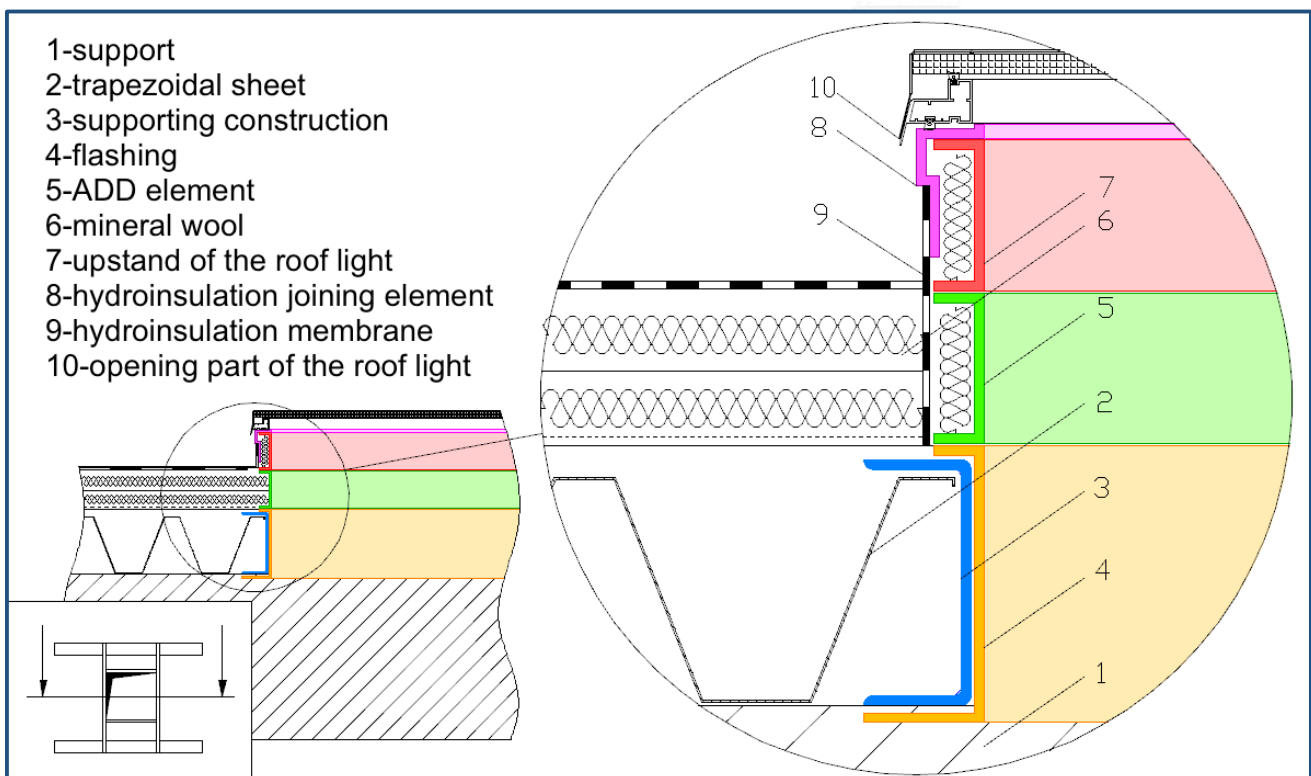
Installation scheme no 2 - multilayer roof type
